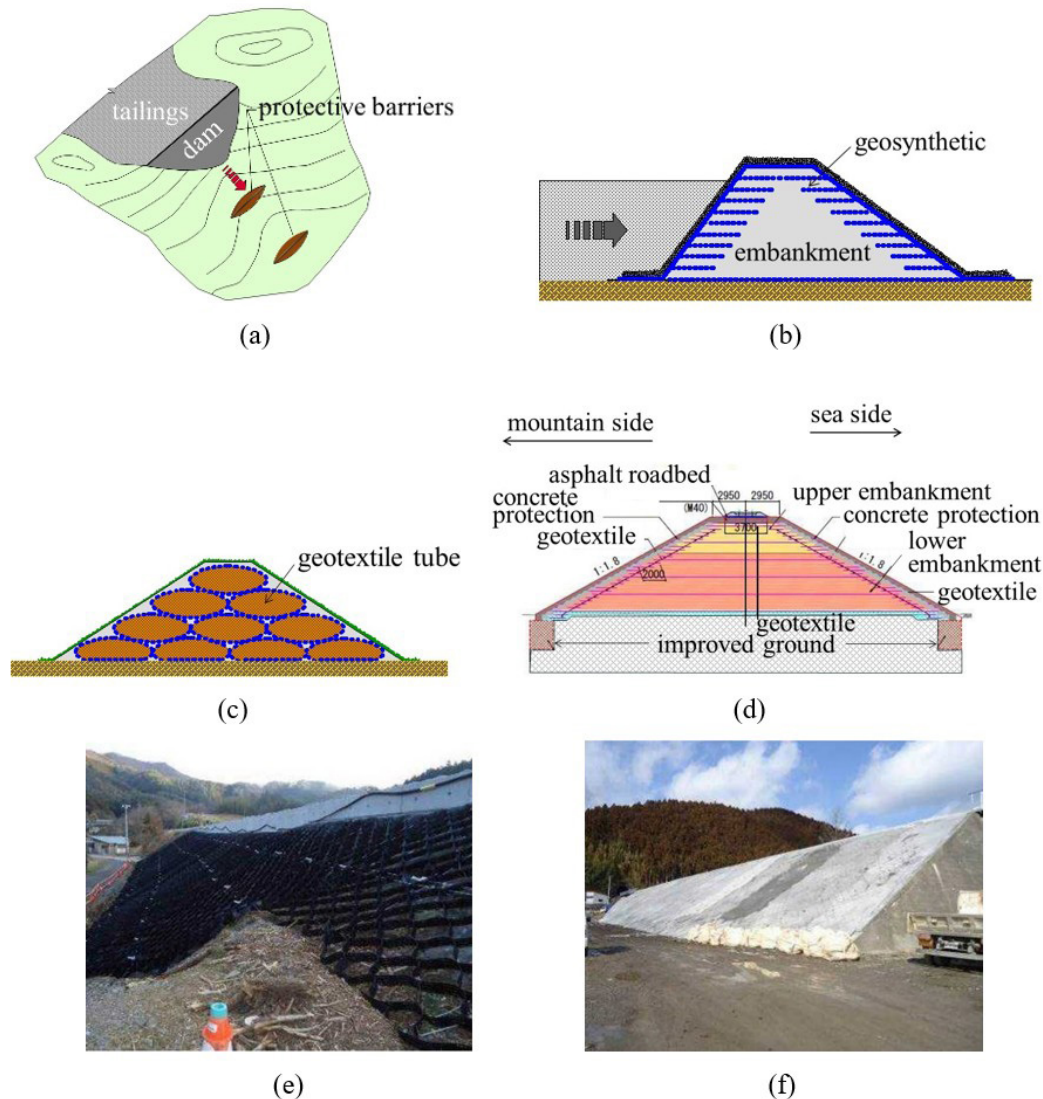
Other applications of protective geosynthetic reinforced barriers: (a) protection against failures or leakage from tailings dams; (b) geosynthetic-reinforced fill barrier; (c) geotextile tubes barrier; (d) tsunami barrier (modified from Shindo & Tatsuoka, 2017); (e) geocell during installation on the slope (Shindo & Tatsuoka, 2017); (f) concrete-filled geocell at the end of construction (Shindo & Tatsuoka, 2017).
